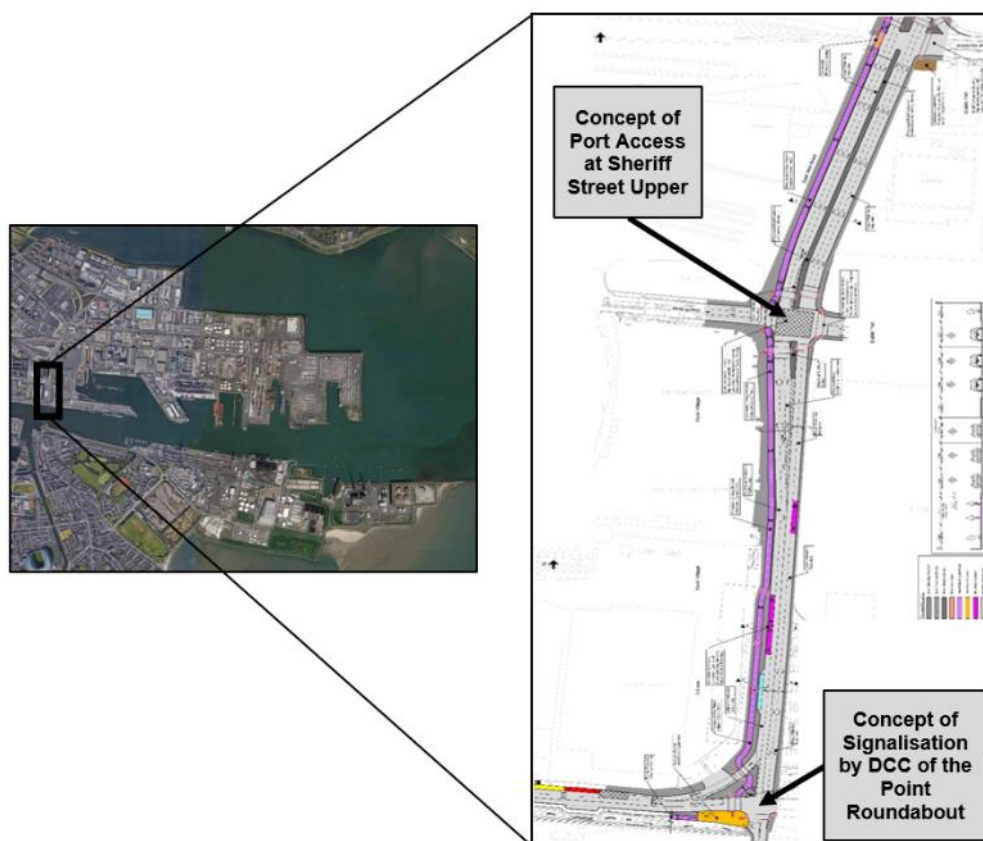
Illustration of Concept DCC Scheme along East Wall Road
